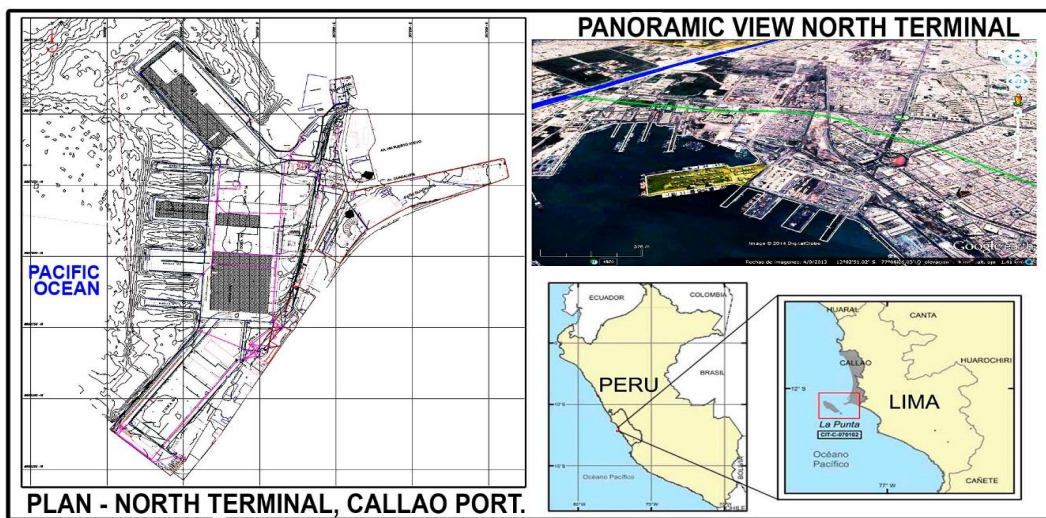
Location of Callao Port and Plan View of North Terminal (Source DRPINT SAC)
